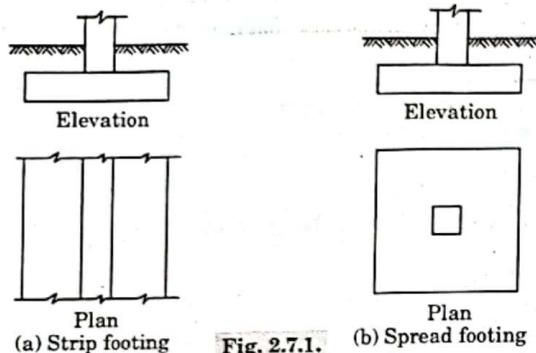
(a) Strip footing (b) Spread footing
